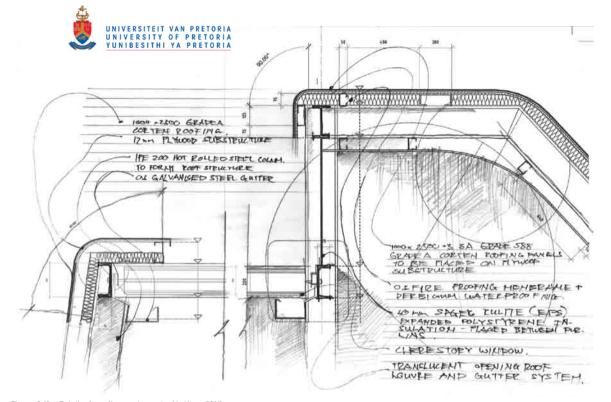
Detail of roofing system, nts (Author, 2011)
